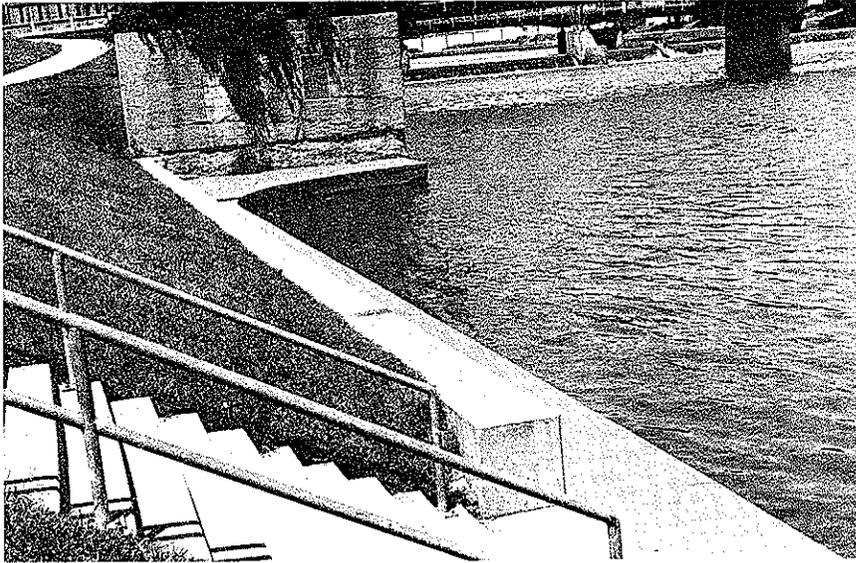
Openings and steps in the floodwall in Waterloo, Iowa, permit public access to the river. A portion of the floodwall can be seen in the background. The floodwall is recessed to allow for this area and bends around to the left of the picture.
